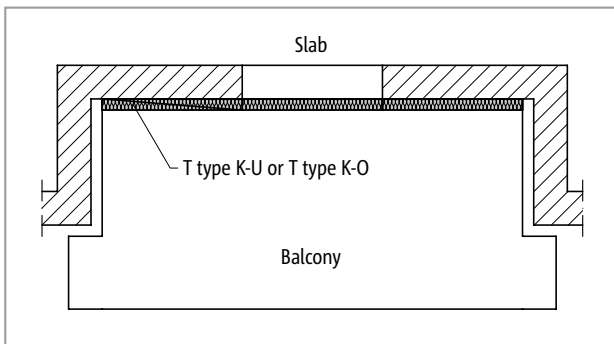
Schöck Isokorb® T type K-U/K-O: Balcony with façade recess
